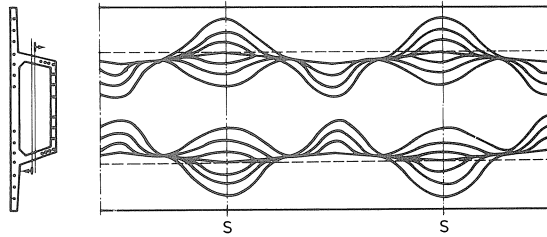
Horizontal plan of tendons in a box girder (width exaggerated).
